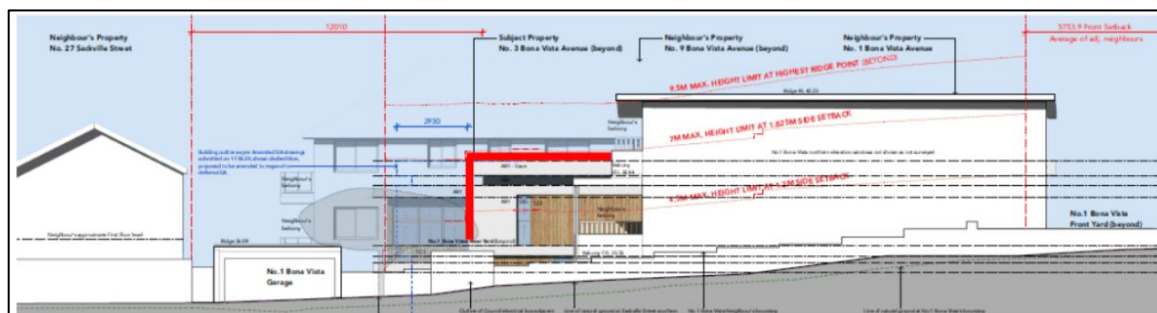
Northern Elevation of 1, 3-7 & 9 Bona Vista Avenue (Source: Applicant)
